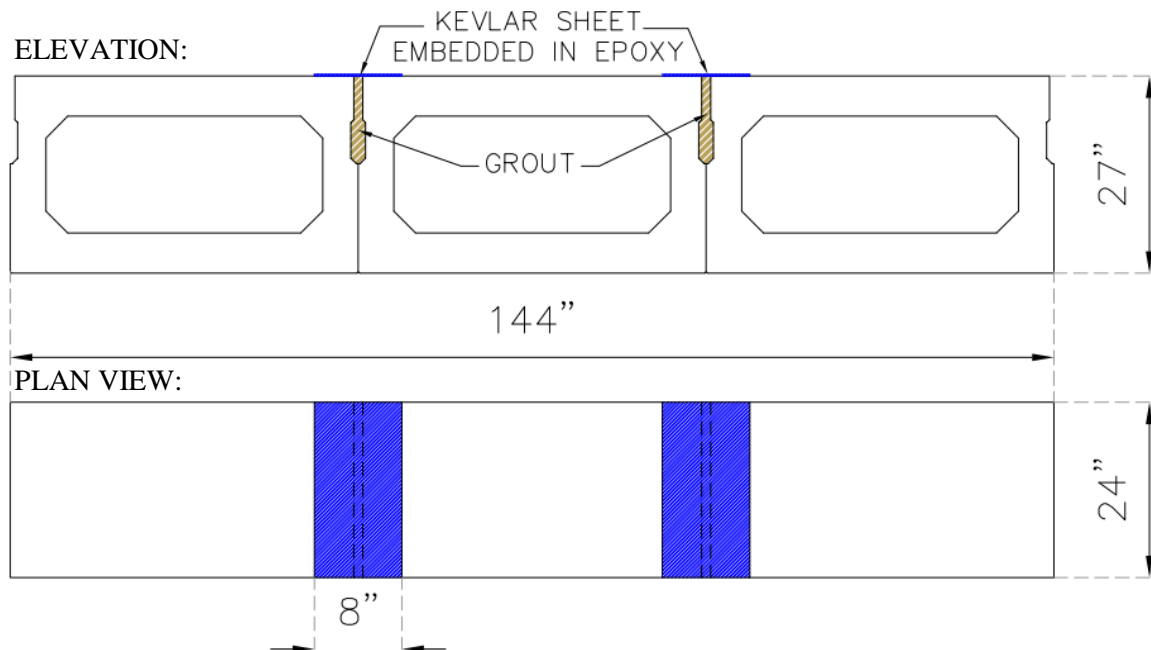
SA specimen with existing connection detail reinforced with Kevlar and Epoxy.
